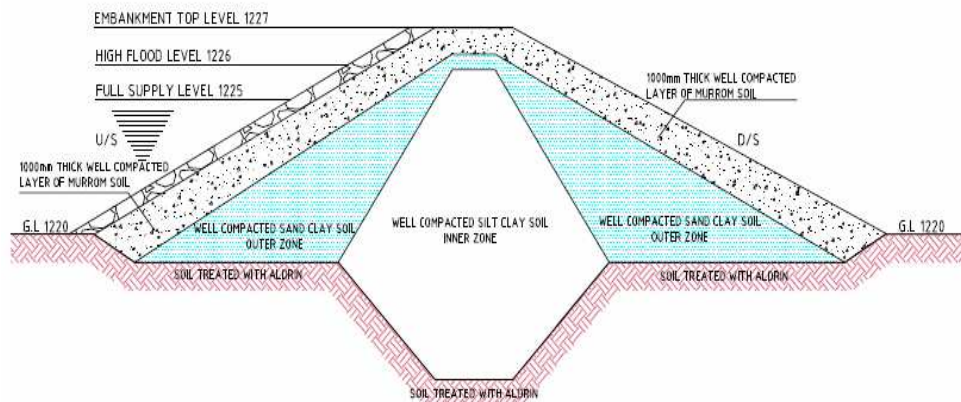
Typical cross-section of dam embankment showing layout of materials for inner zone, outer zone and upstream and downstream protection
